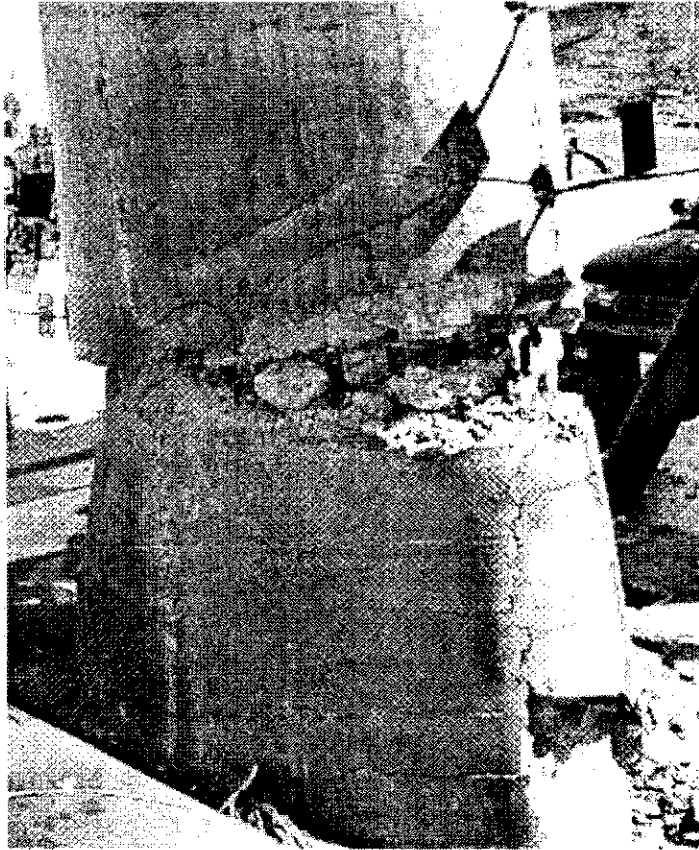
Specimen FR, After Testing, Jacket Removed
